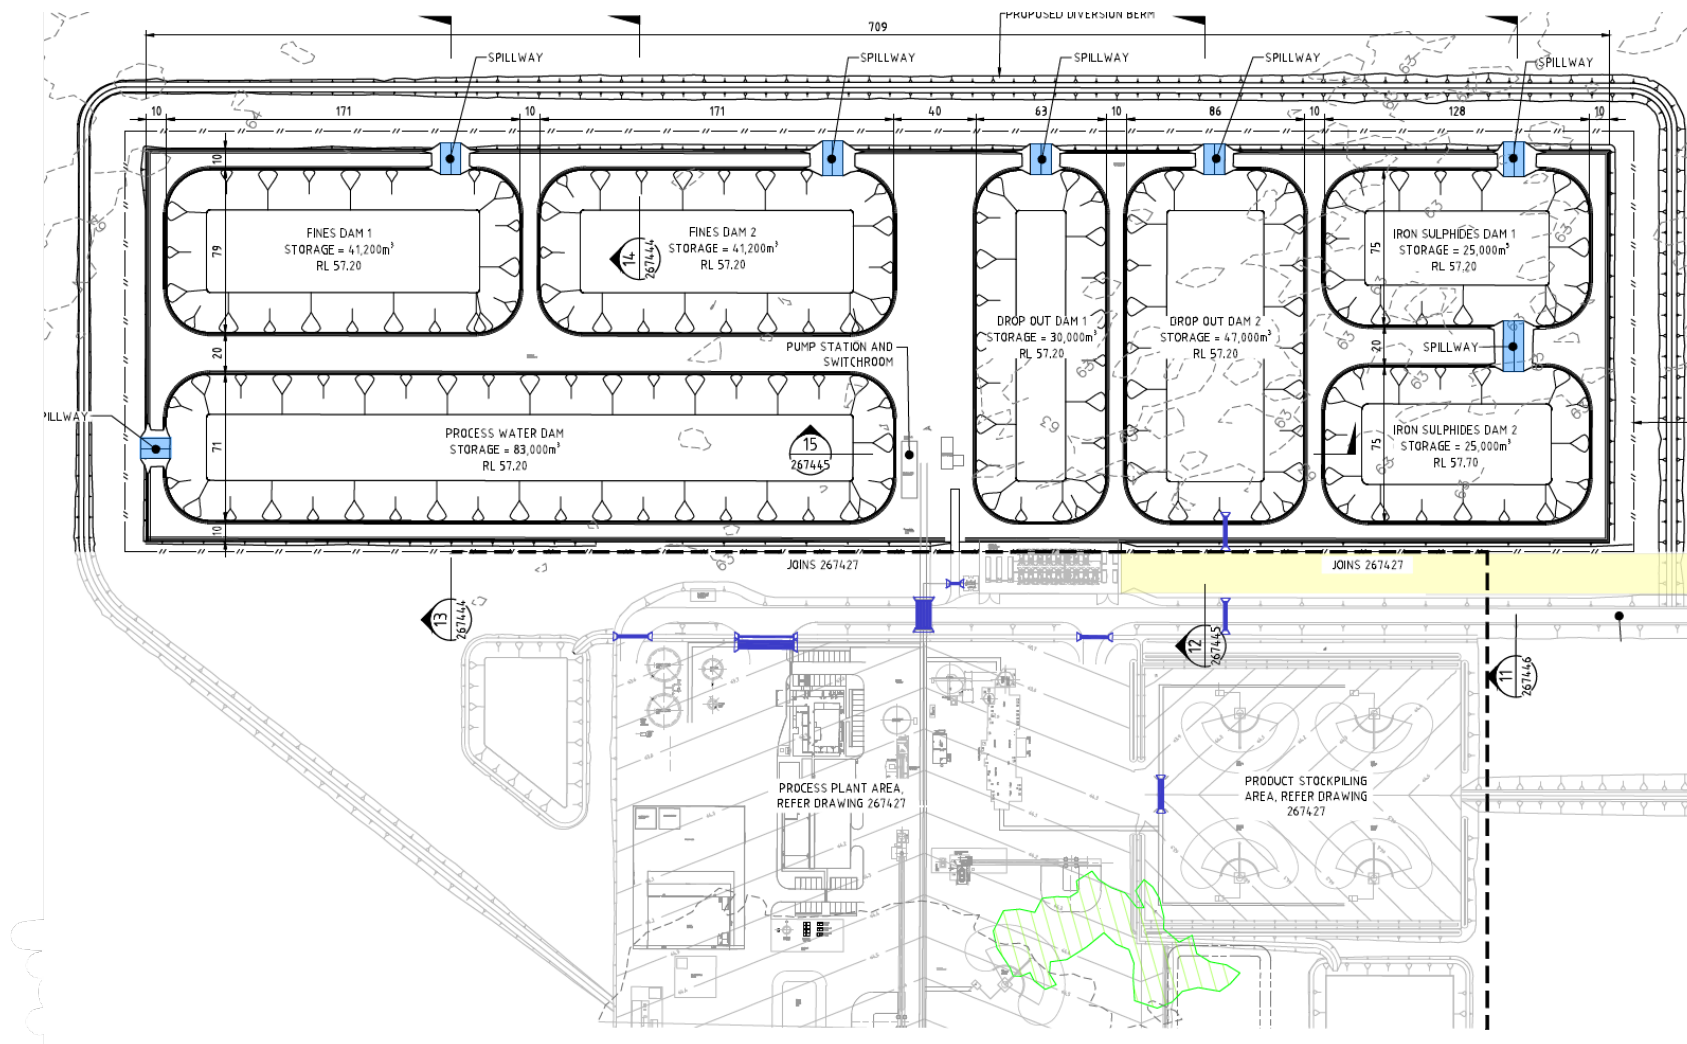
Conceptual plan view drawing of the ore processing plant and water infrastructure. The layout will be optimised prior to construction.
